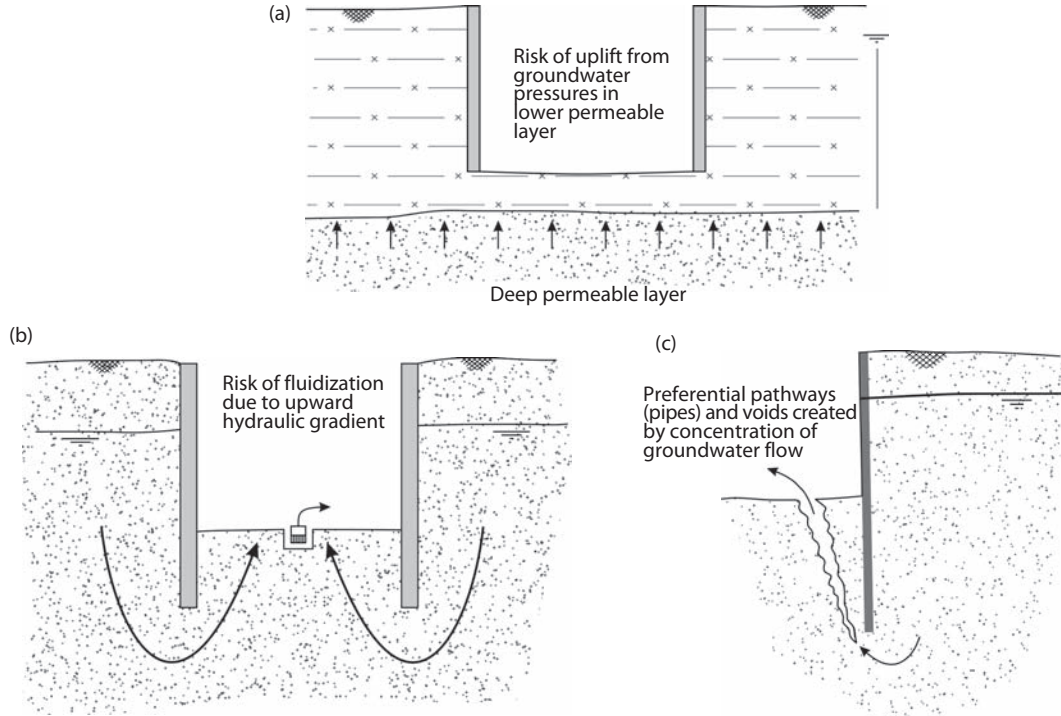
Base instability of excavations. (a) Buoyancy or uplift failure. Upward groundwater pressure from the deep permeable layer exceeds the deadweight and shear resistance of the plug of low-permeability soil in the base of the excavation. Heave or uplift may result. (b) Fluidization due to upward seepage gradients. Upward groundwater flow into the base of an excavation results in very low effective stresses. “Boils” or quicksand conditions may result. (c) Piping. Groundwater flow results in the movement of particles within the soil, creating voids or “pipes” within which the flow of groundwater is concentrated.
